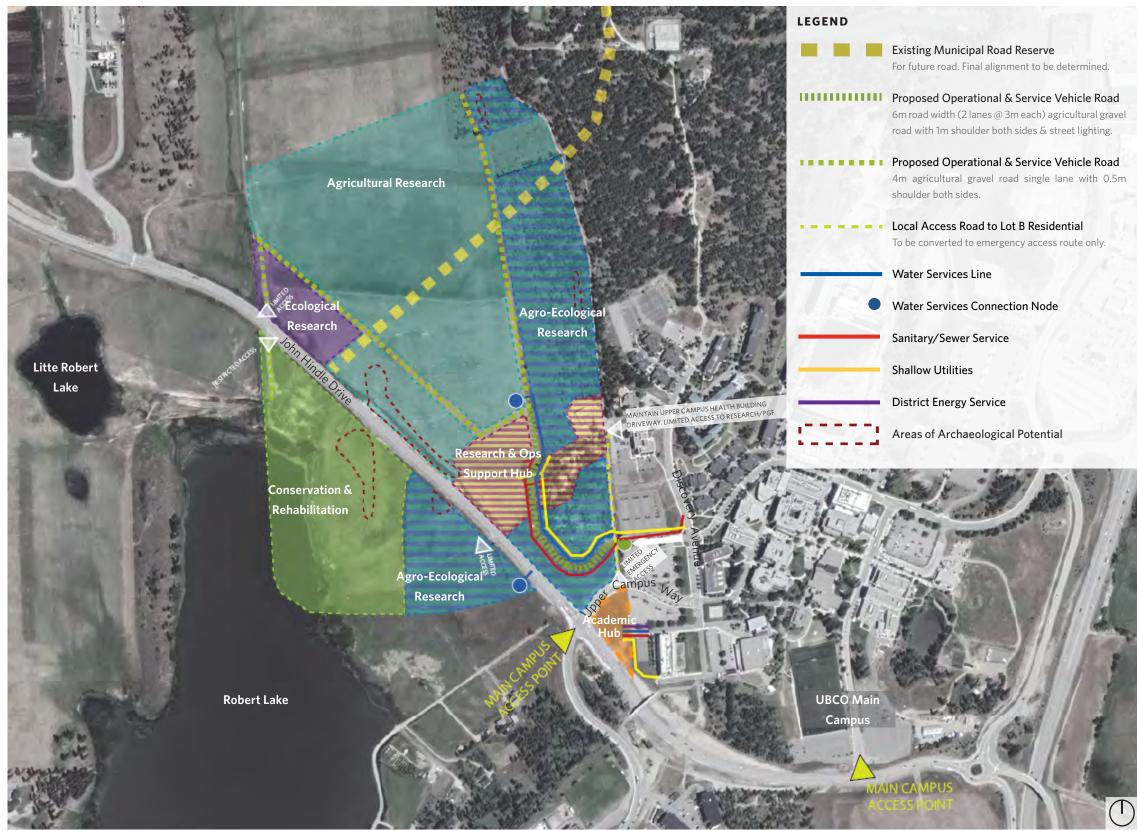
Conceptual Structure Plan: Services Plan
